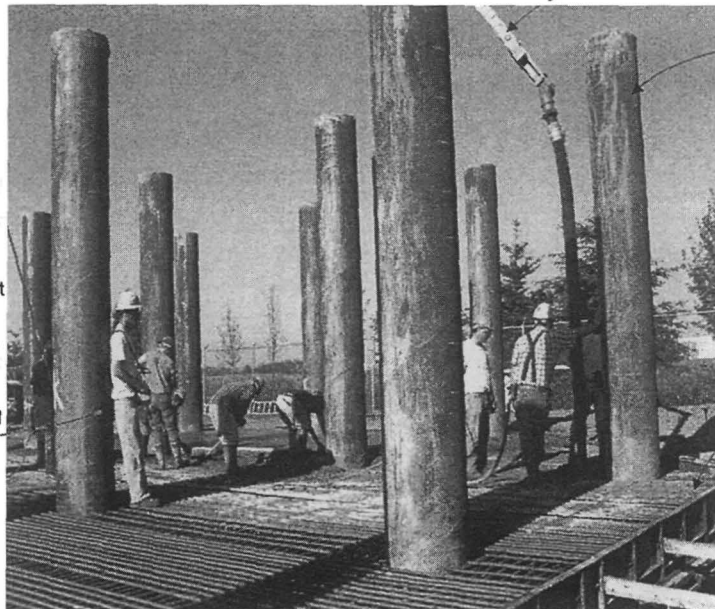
This view shows the concrete placers, the pump boom operator, and the concrete finishers (in the background).
